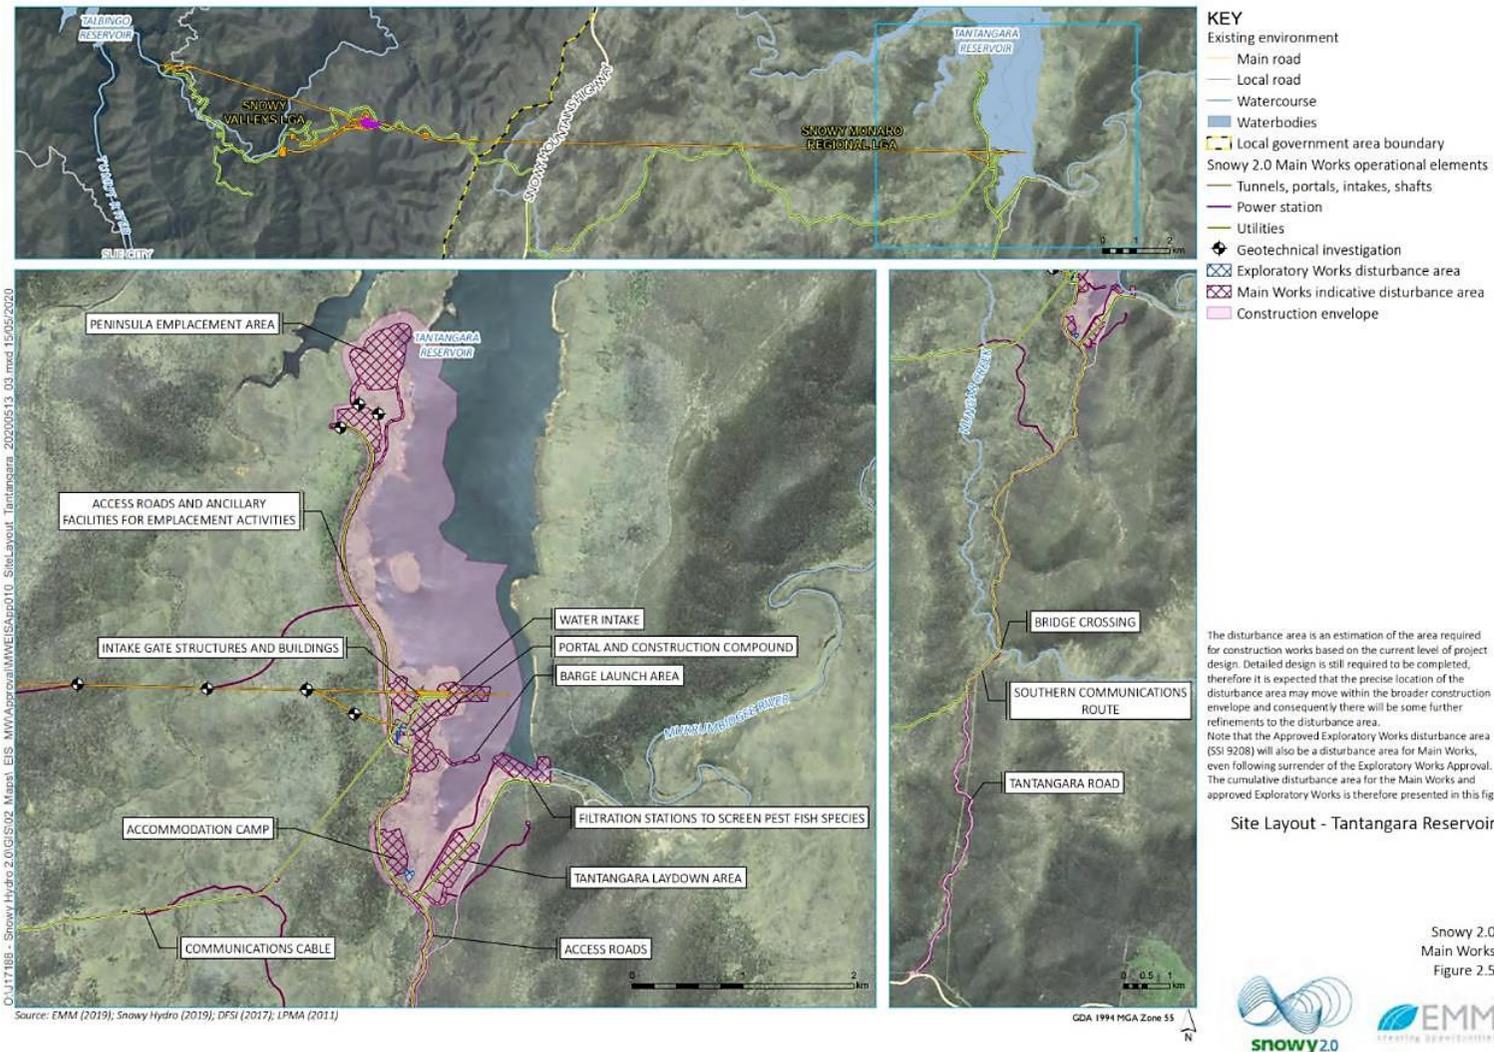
Construction areas – Tantangara (Infrastructure Approval Appendix 2)
